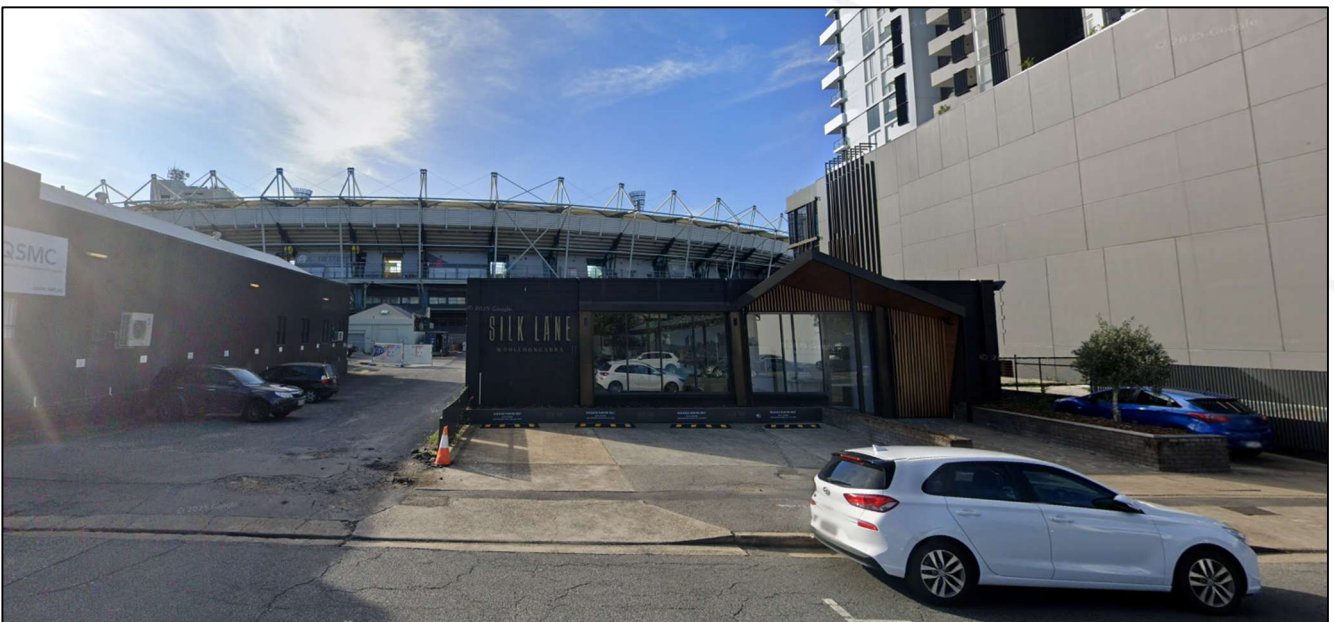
Subject site from Stanley Street at Gabba stadium viewing south-west (Source: Google Maps 2022)
